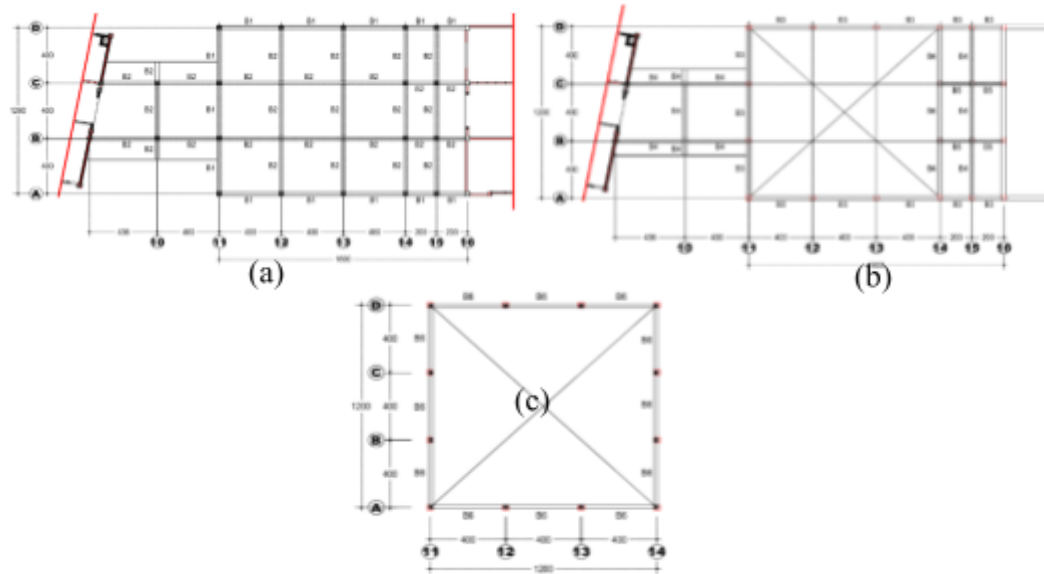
Construction plan for beams and slabs (a) Floor plan elv.+4 m (b) Floor plan elv.+7,2 m
